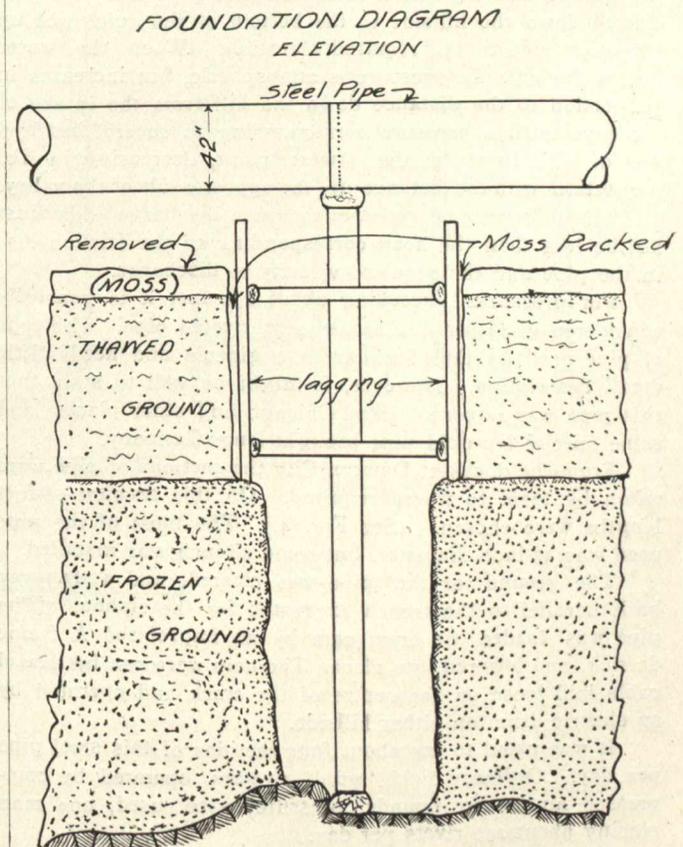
Cross-section of Ground and Foundation Diagram.
